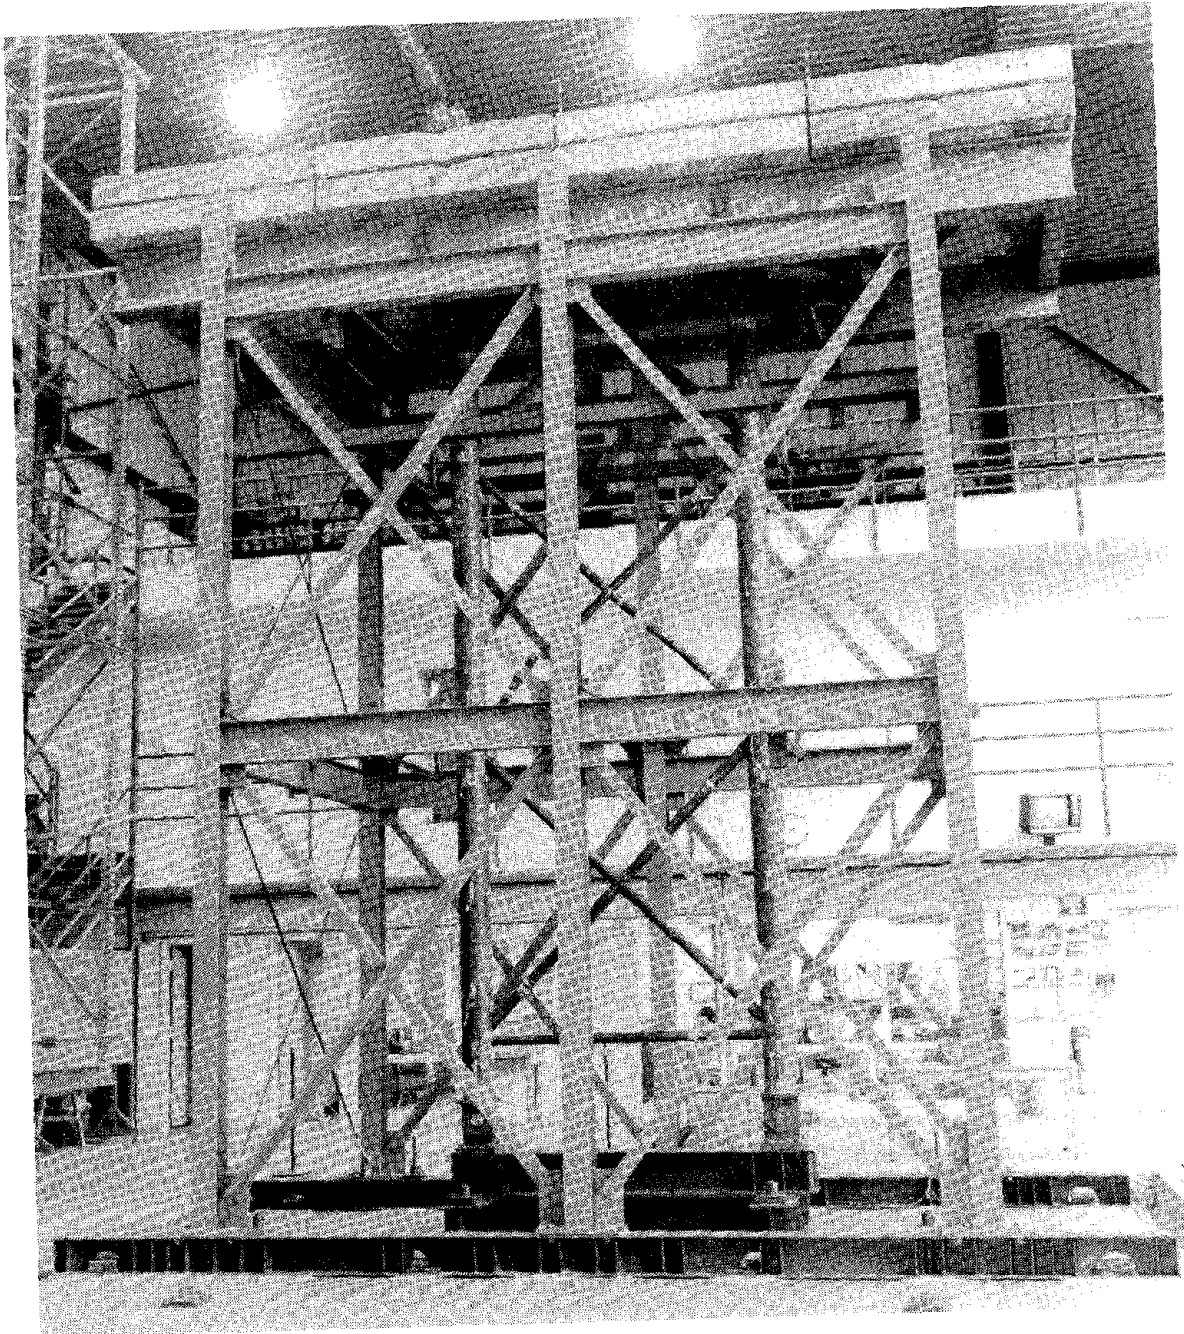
A Front View of the Test Model and the Lateral Support Fixture.
